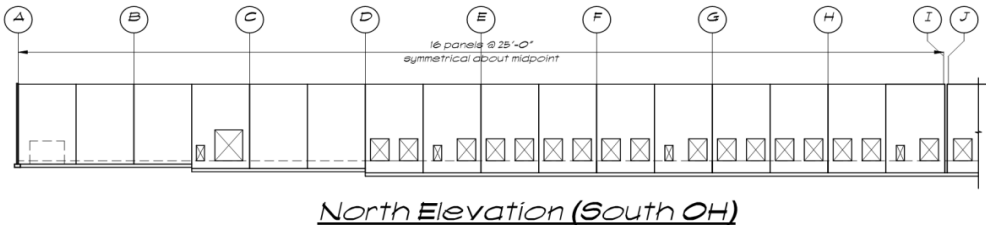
Elevation of north (side) wall of the warehouse building (all designs).
